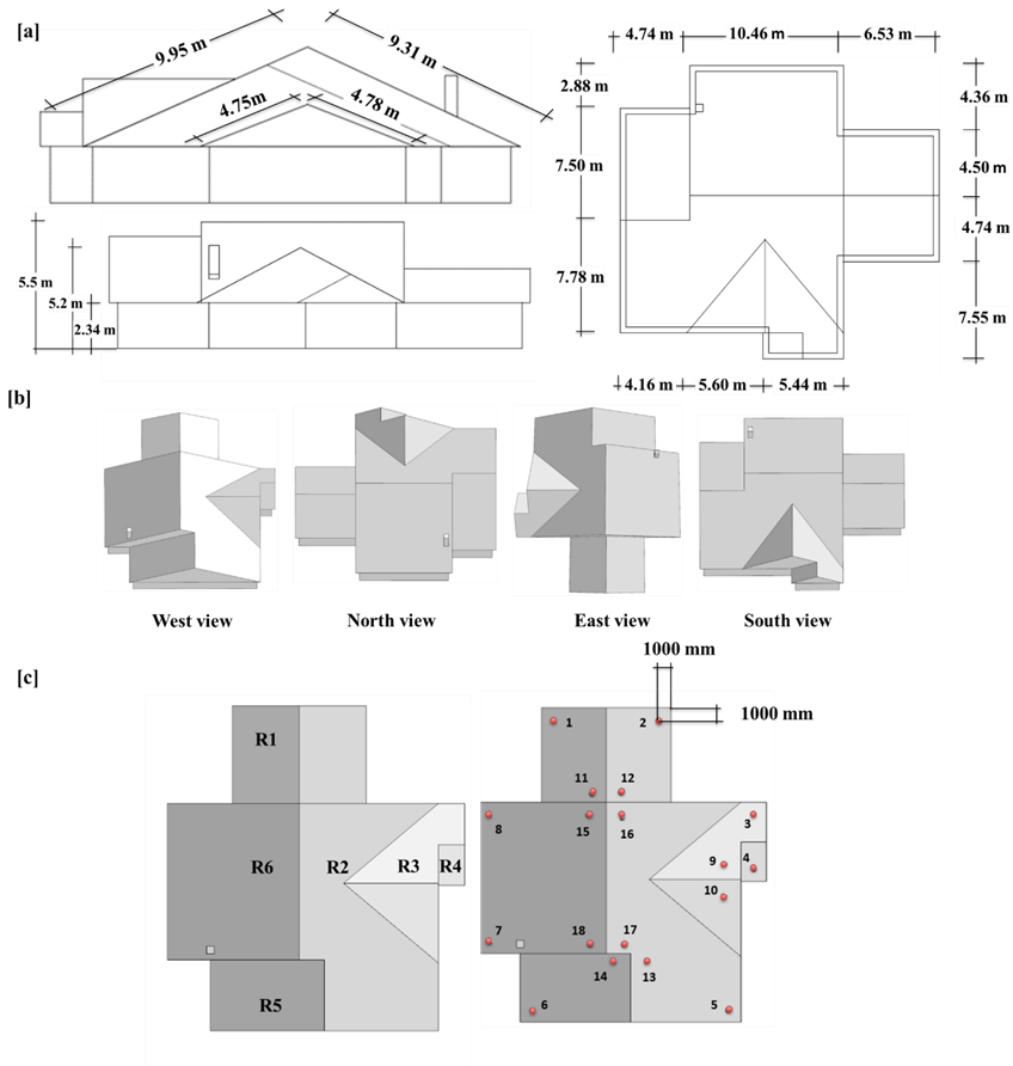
The original building geometry used in this study is (a) dimensions, (b) 3D view layout, and (c) pressure probe locations and roof surfaces.
